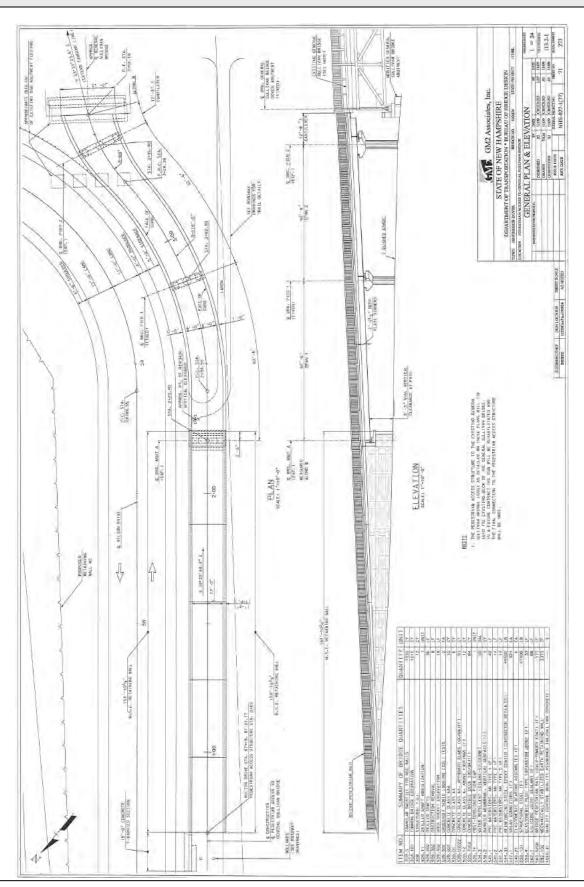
2009 plans for the new north bridge approach and abutment modification, General Plan and Elevation.
